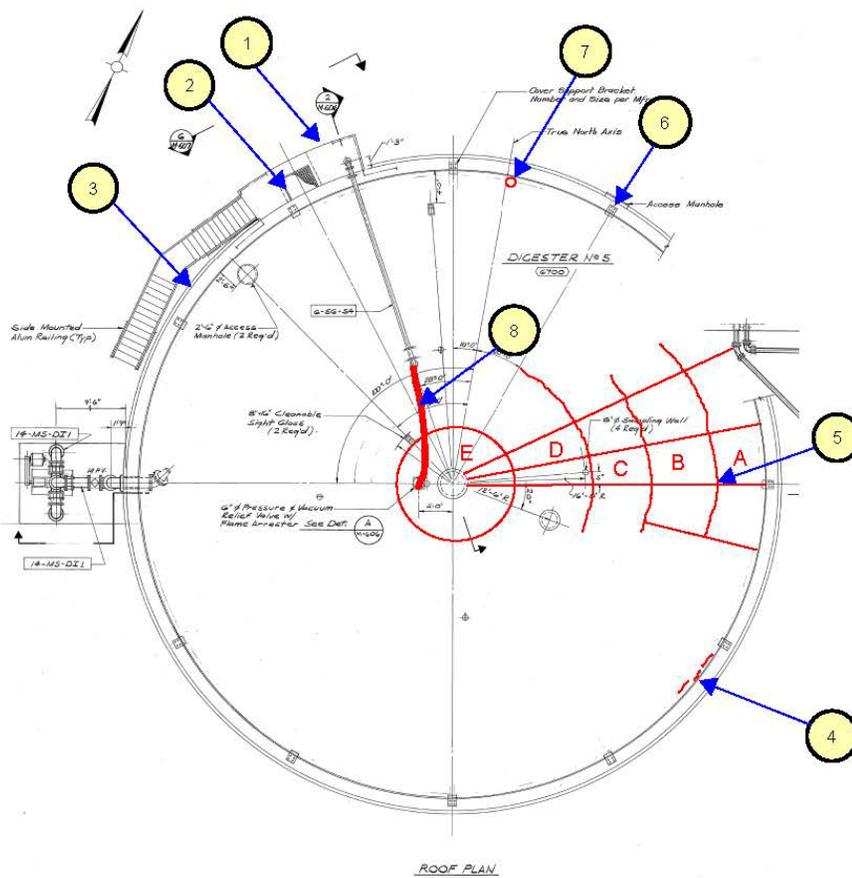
Concrete Crack Repairs at Digester No. 5
